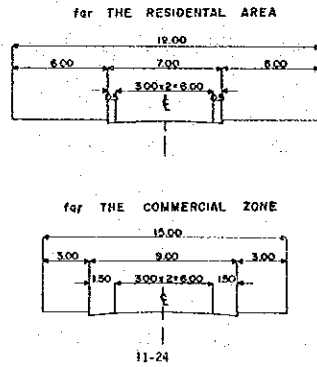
(2) Cross Section for the Streets Plan in Barranquilla
